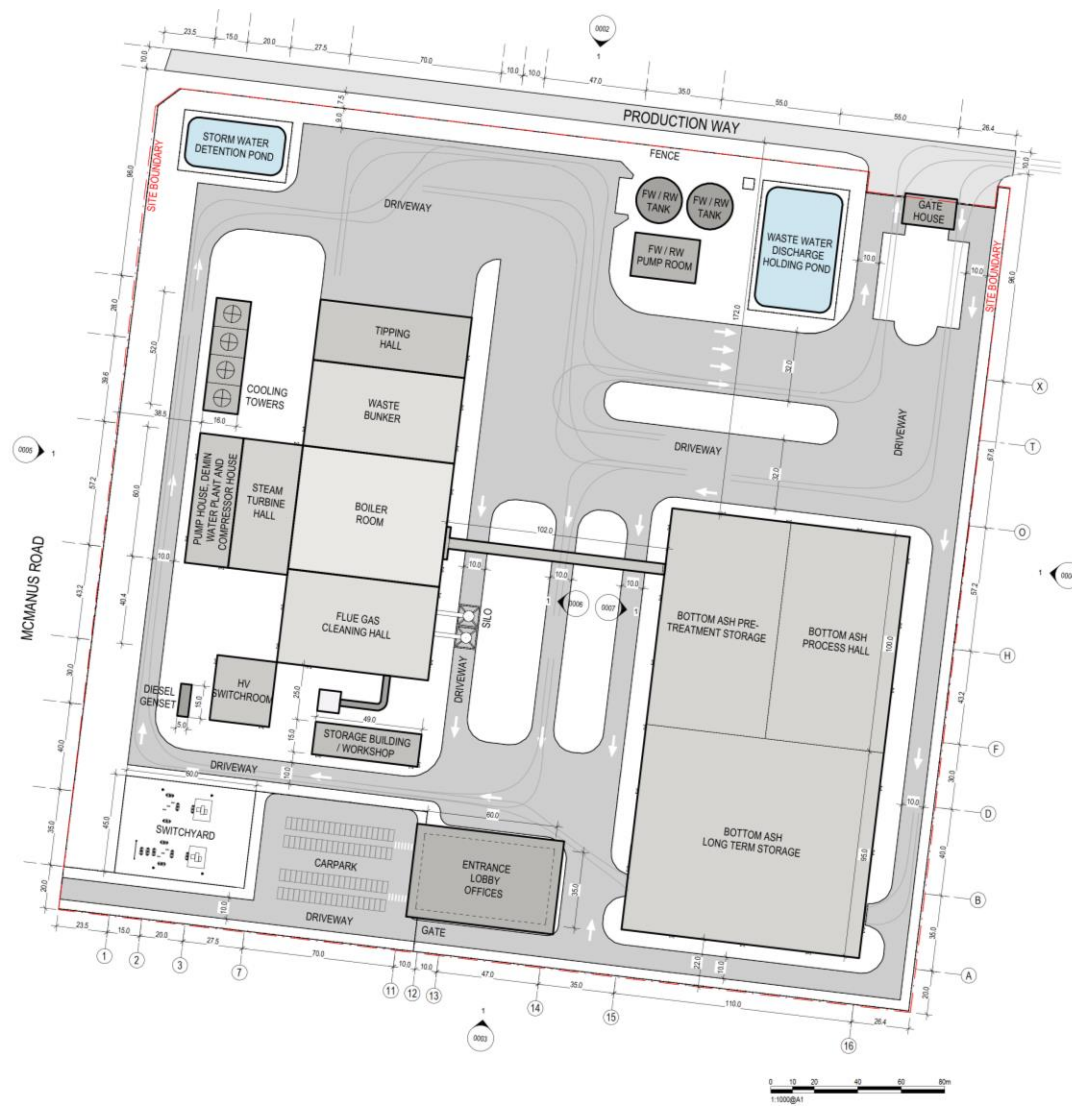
Proposed Site Layout (Jacobs, 2020)
